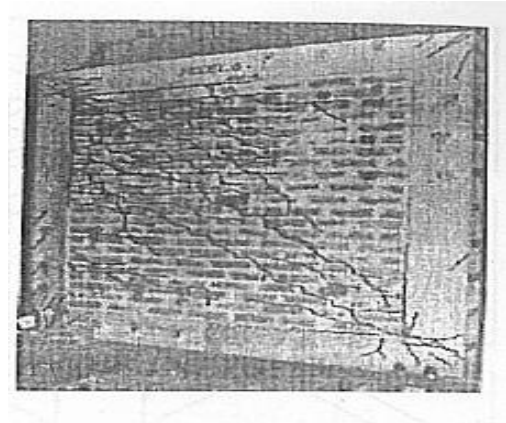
Failure mode of Specimen (Choubey, 1990[10])
